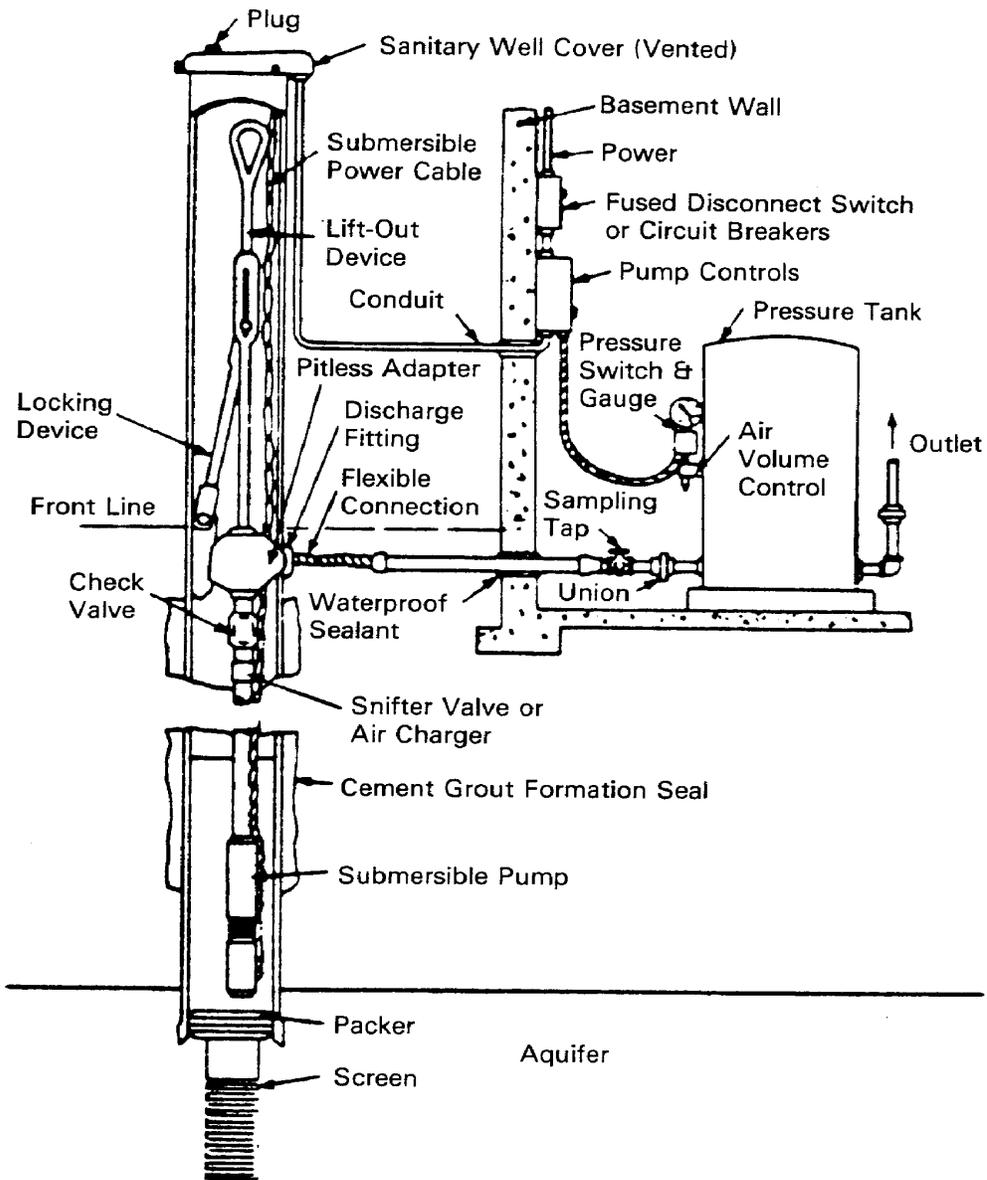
Pitless Adapter with Submersible Pump Installation for Basement Storage
